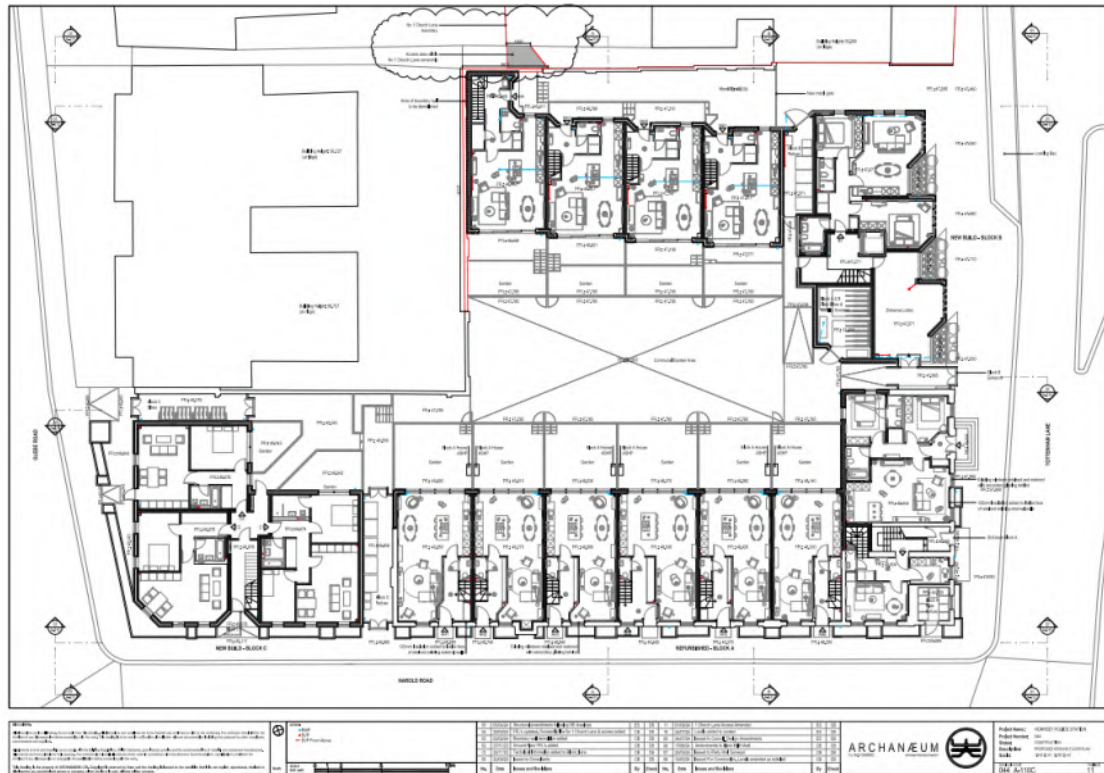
Proposed site plan (source: Archanaeum Ltd)
